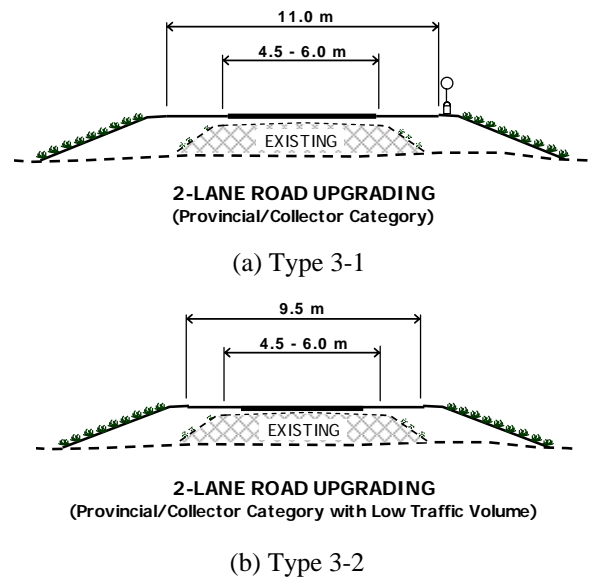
2 and 3-Digit Road Improvement Master Plan with Typical Road Cross-Sections
